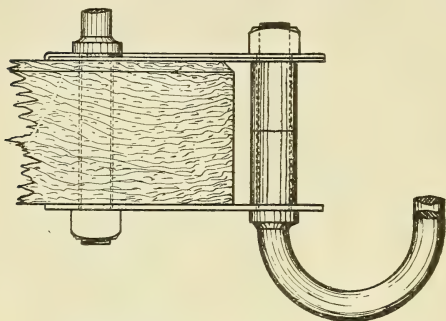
Elevation (Scale $\frac{1}{4}$)
